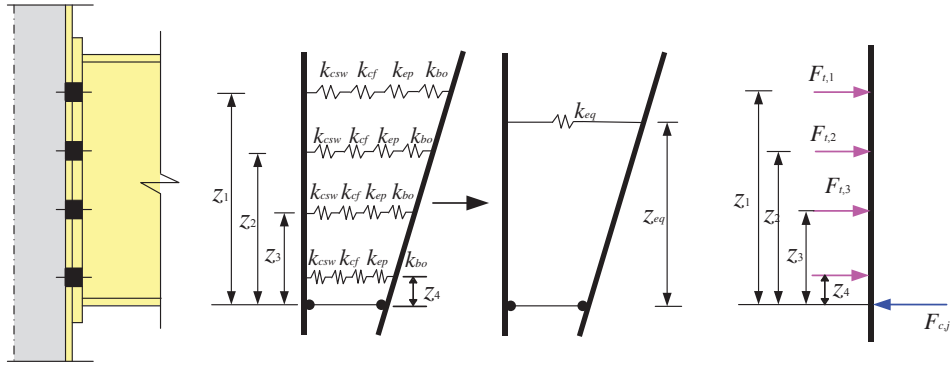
Illustration of beam end rotation with blind bolted endplate joints
